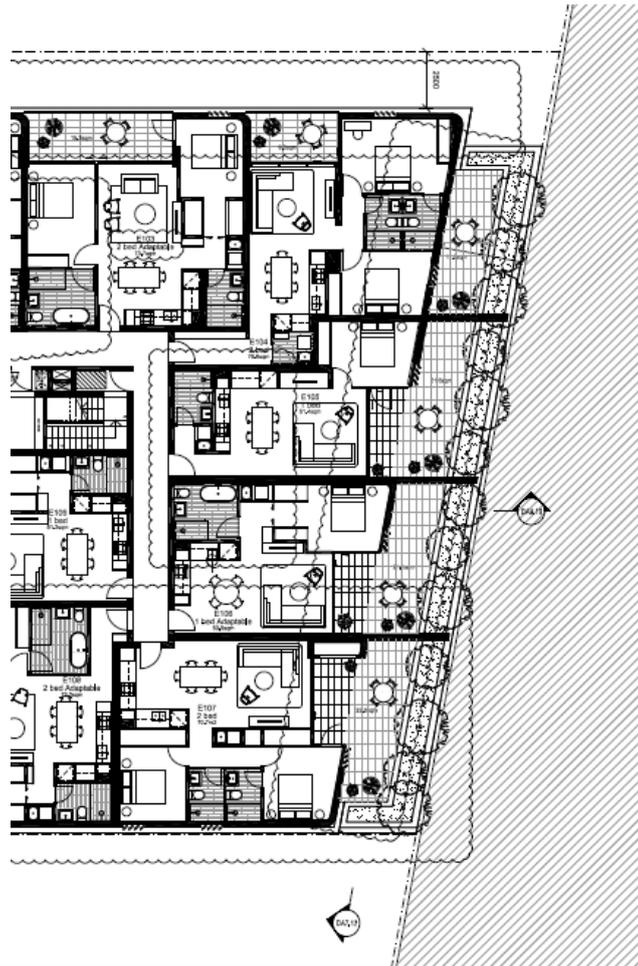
Level 1 plan of approved adjoining development at 1A Coulson Street
